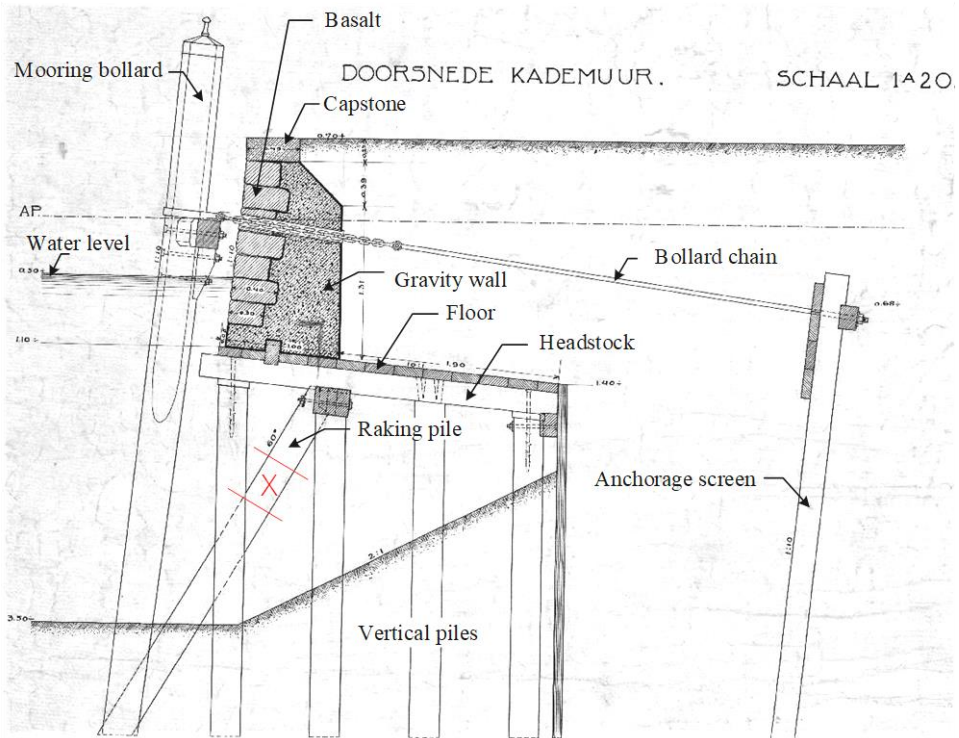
, Cross-sectional technical drawing on Overamstel quay wall obtained from Archive of Gemeente Amsterdam. Terminology of structural elements is provided.
